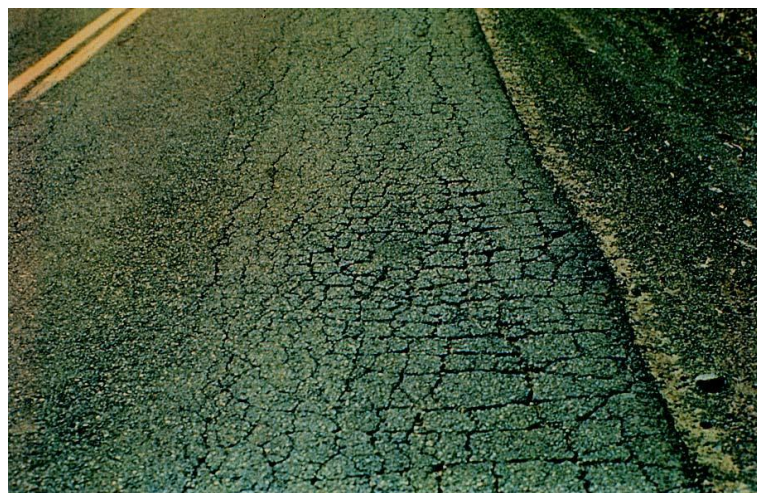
An example of very severe fatigue cracking on flexible pavements (Pavement Interactive website)
